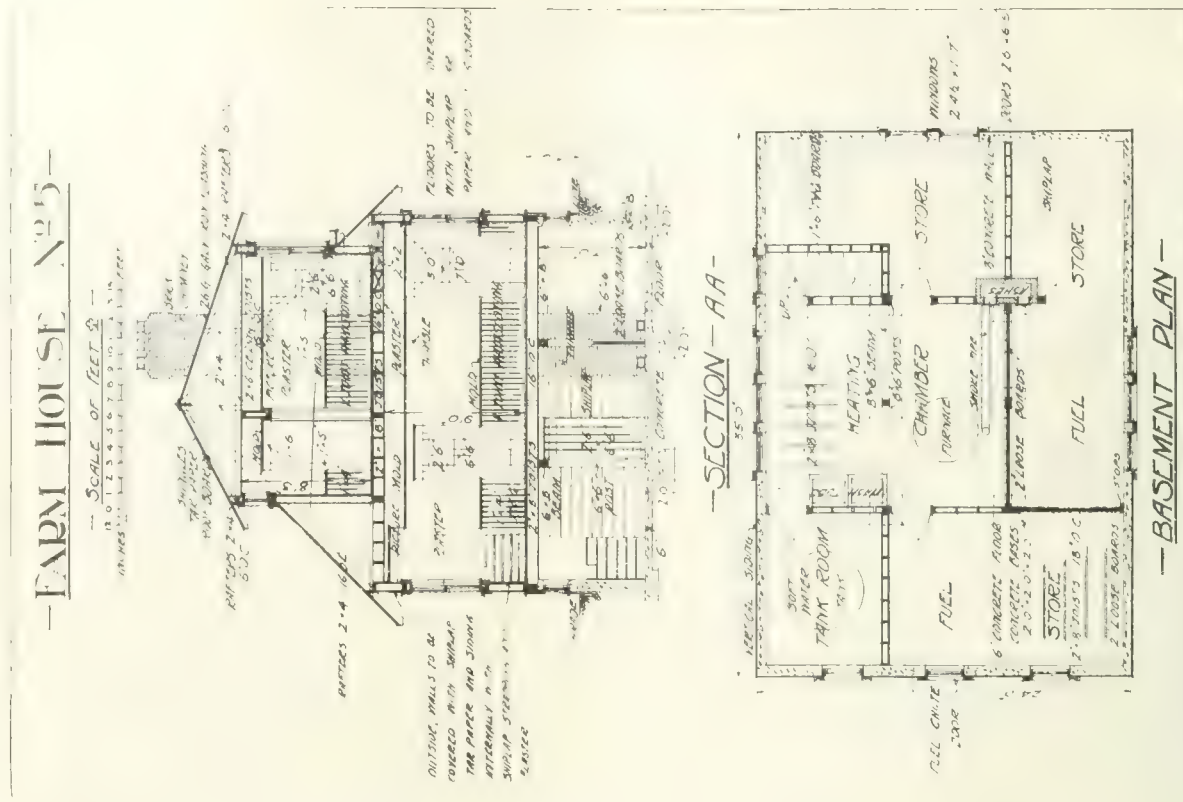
The basement is the full size of the house and contains a heating chamber, a room for a rain water tank, two fuel store rooms or bins, and one general store room.
